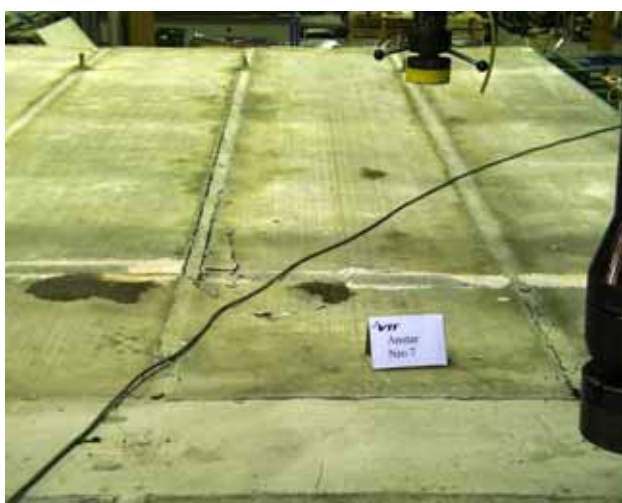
Longitudinal cracking along joint between slabs 6 and 7.
